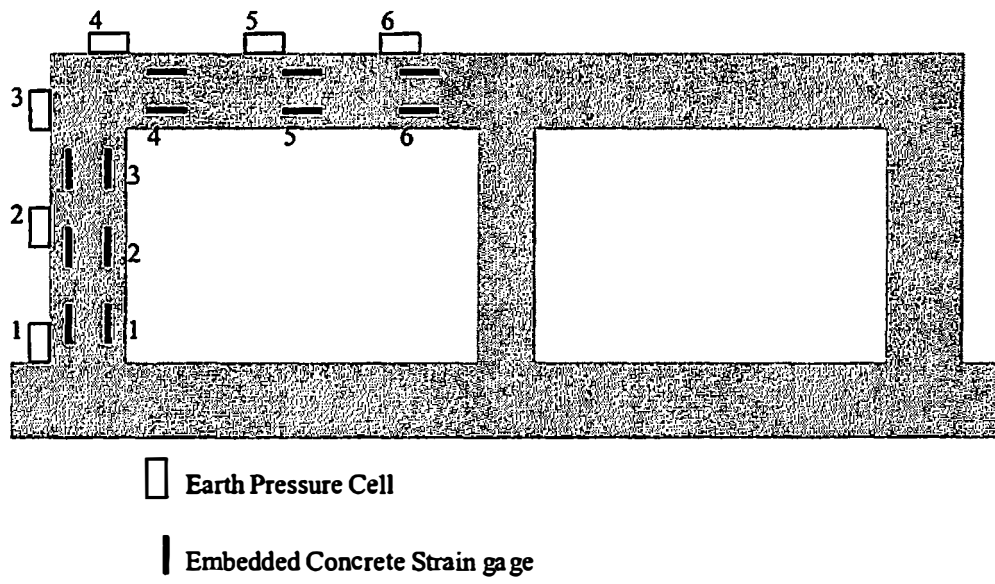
Typical Culvert Instrumentation Layout and Numbering Scheme.
